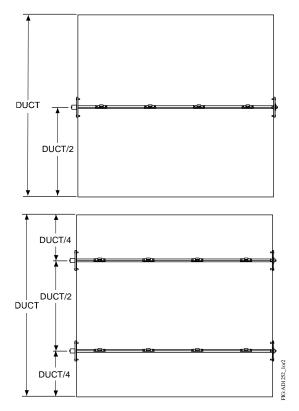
Rectangular Duct Mounting - One and Two Probe Configurations
